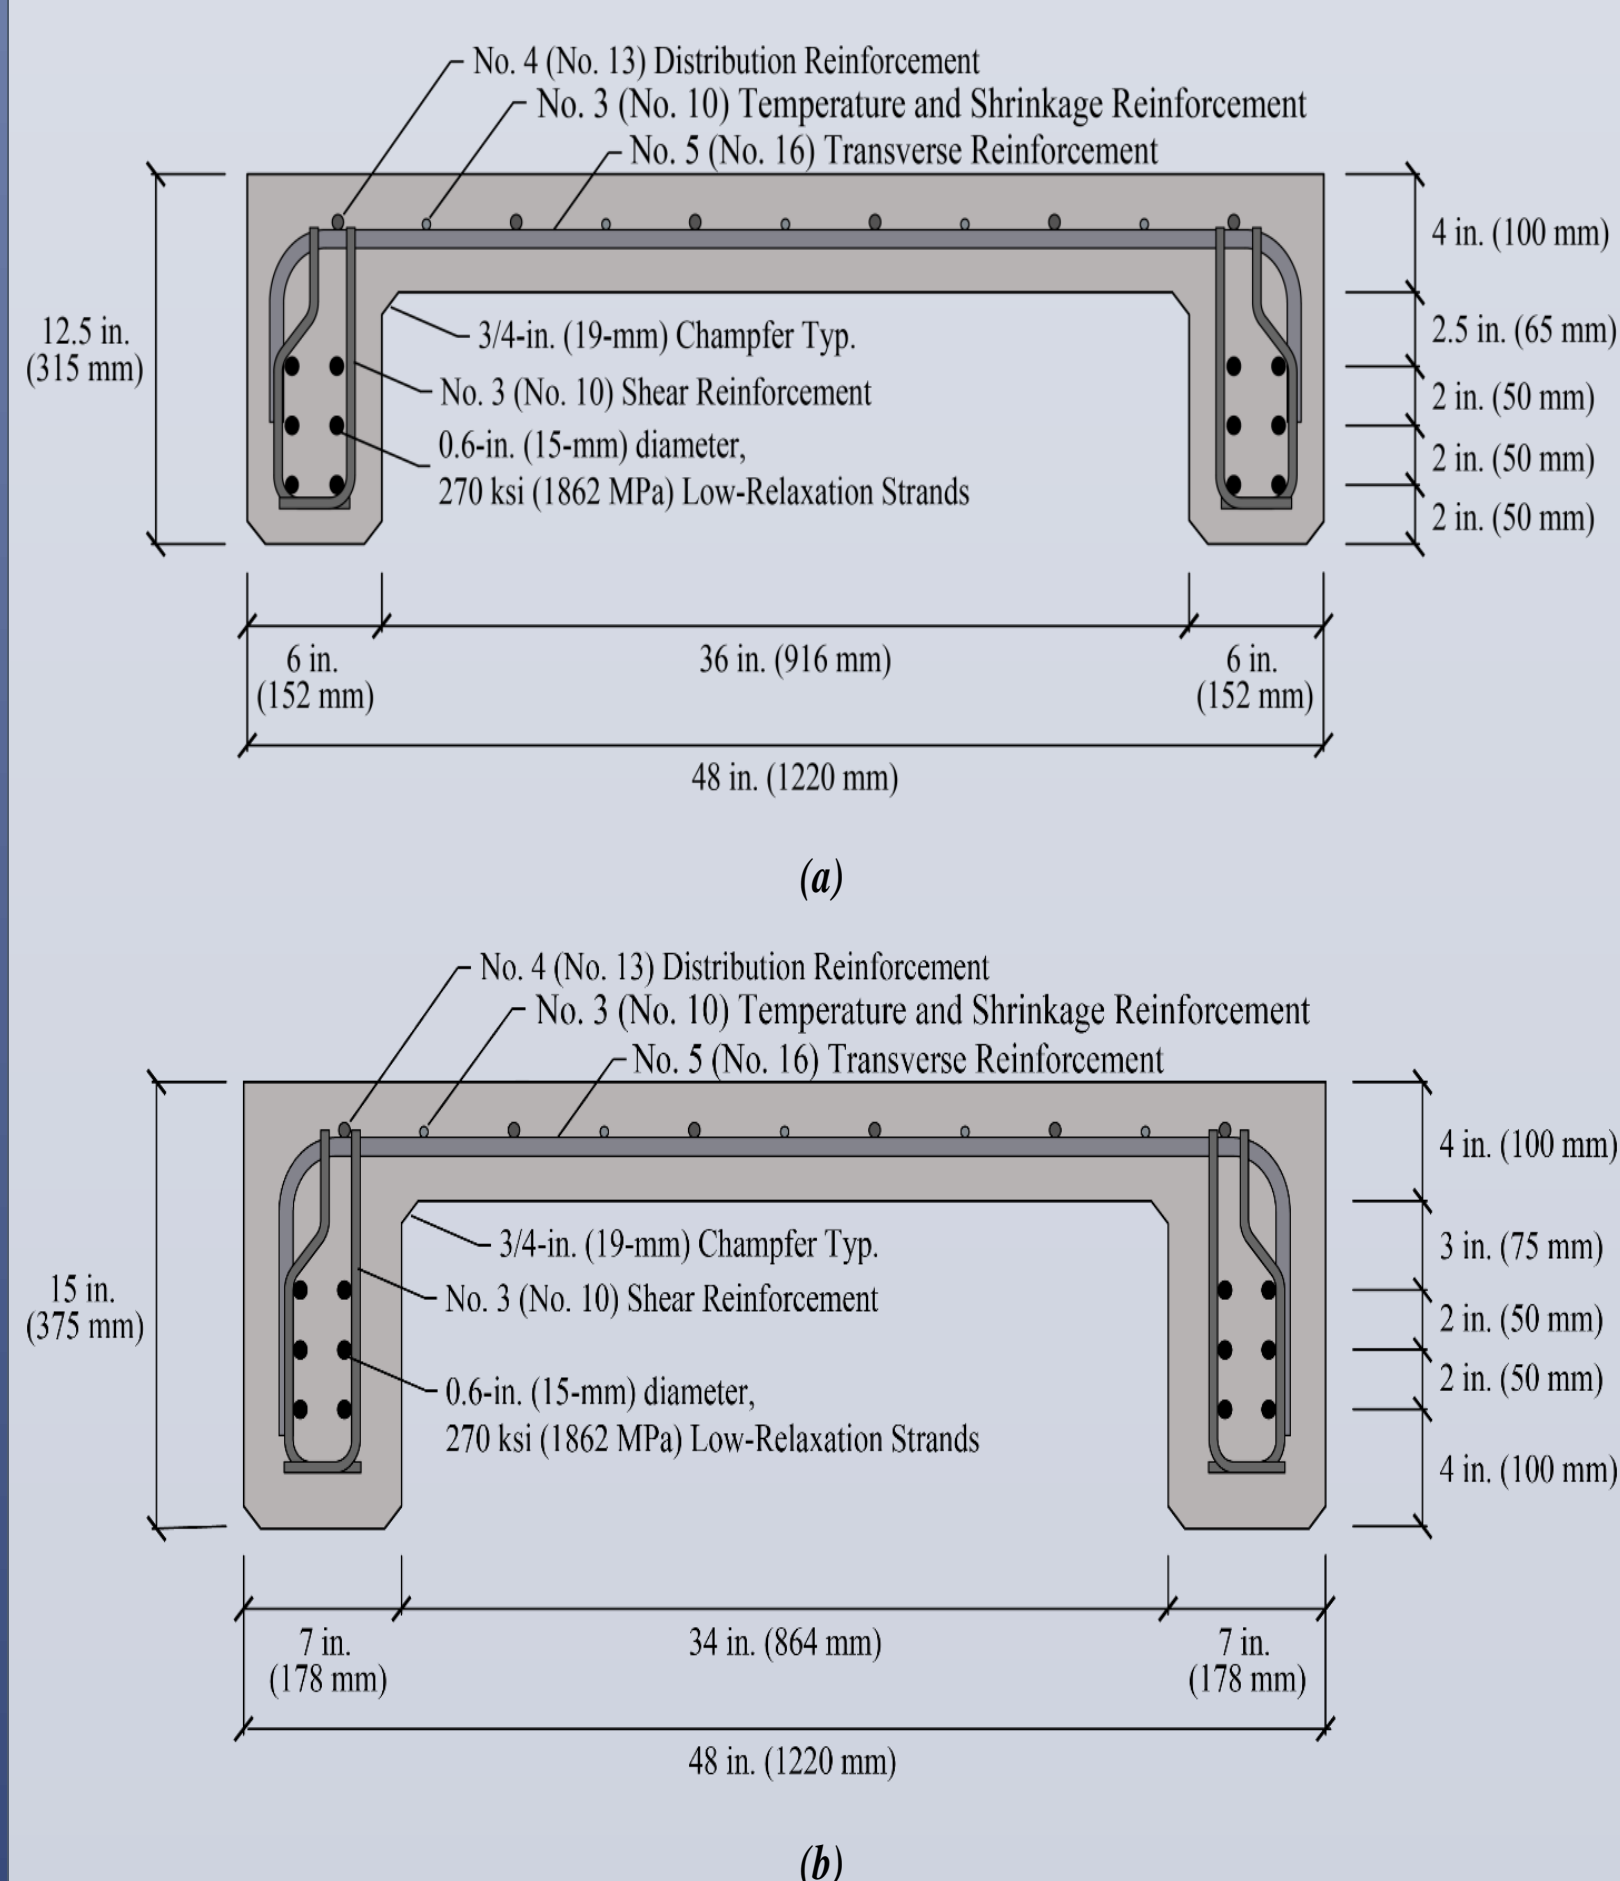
Reinforcement layout (a) UHPC cross-section and (b) HPC cross-section
